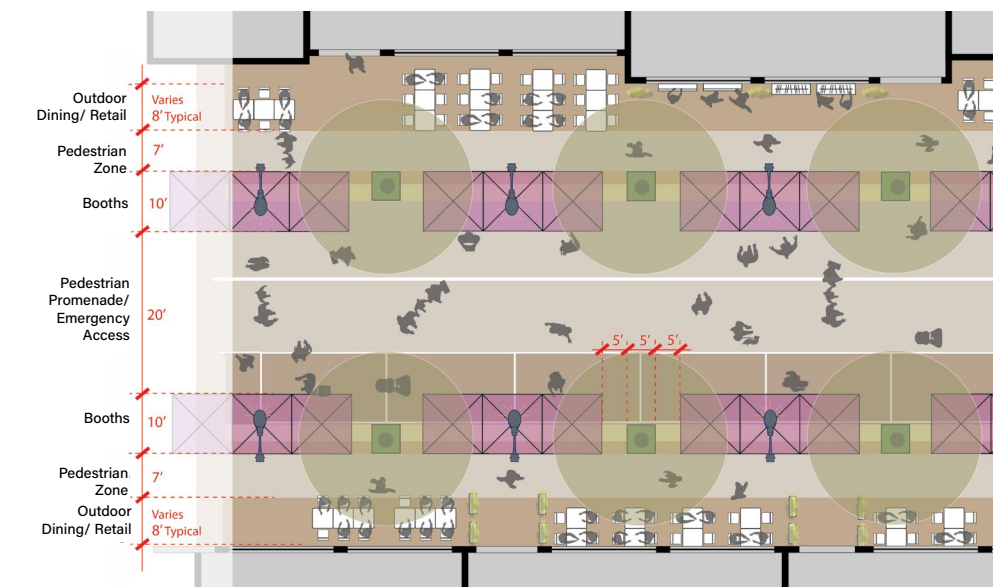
600 & 800 BLOCK LAYOUT (OUTDOOR DINING/ RETAIL ARRANGEMENT STUDY – FARMERS' MARKET SCENARIO)
